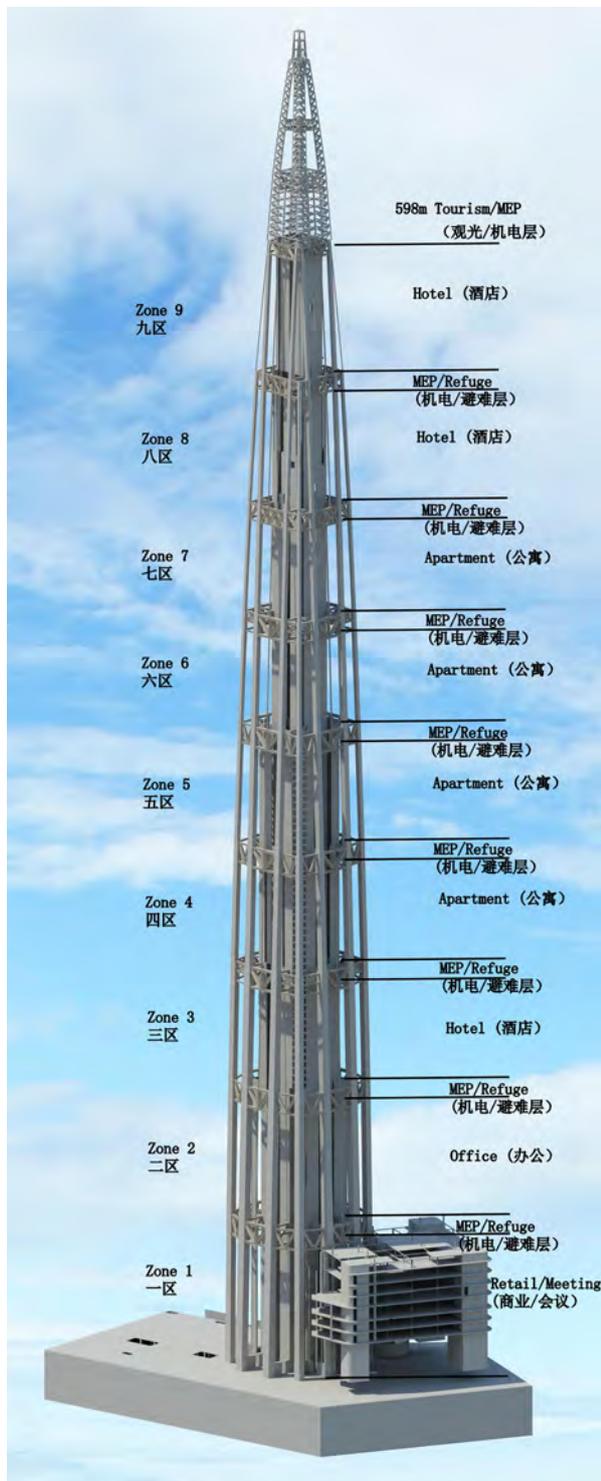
Tower Main Lateral System (Source: Thornton Tomasetti)
